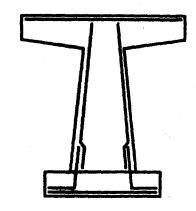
Primary Reinforcing Steel in Hammerhead Pier
